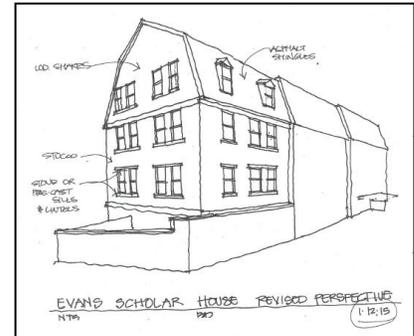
Revisions to addition roof shape per Planning Board & Ldrc
